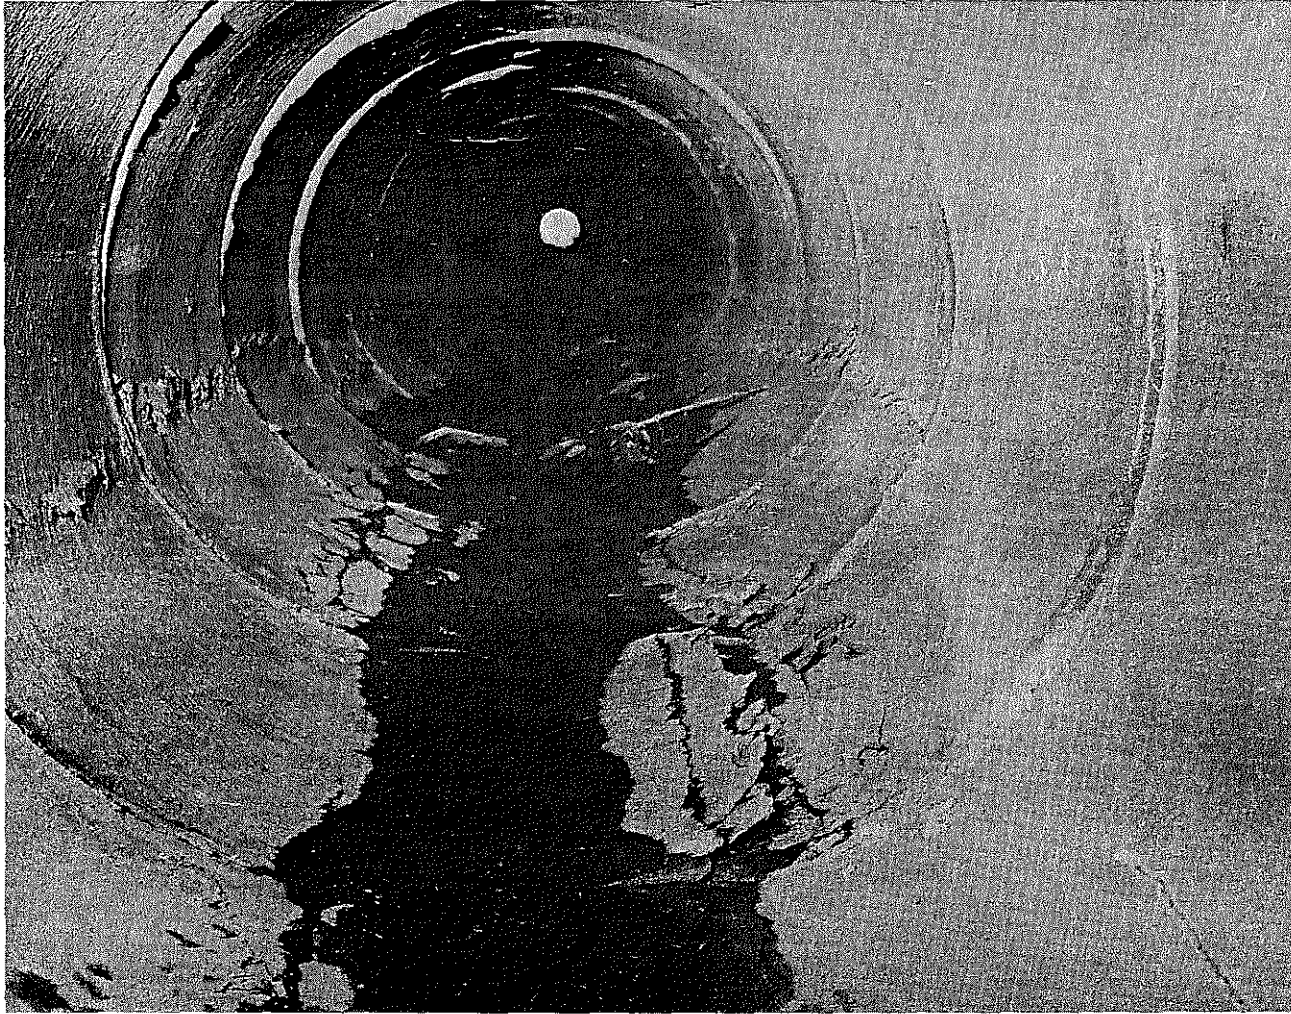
Failure in Top of 54-inch Culvert Under a 32-foot Fill,
